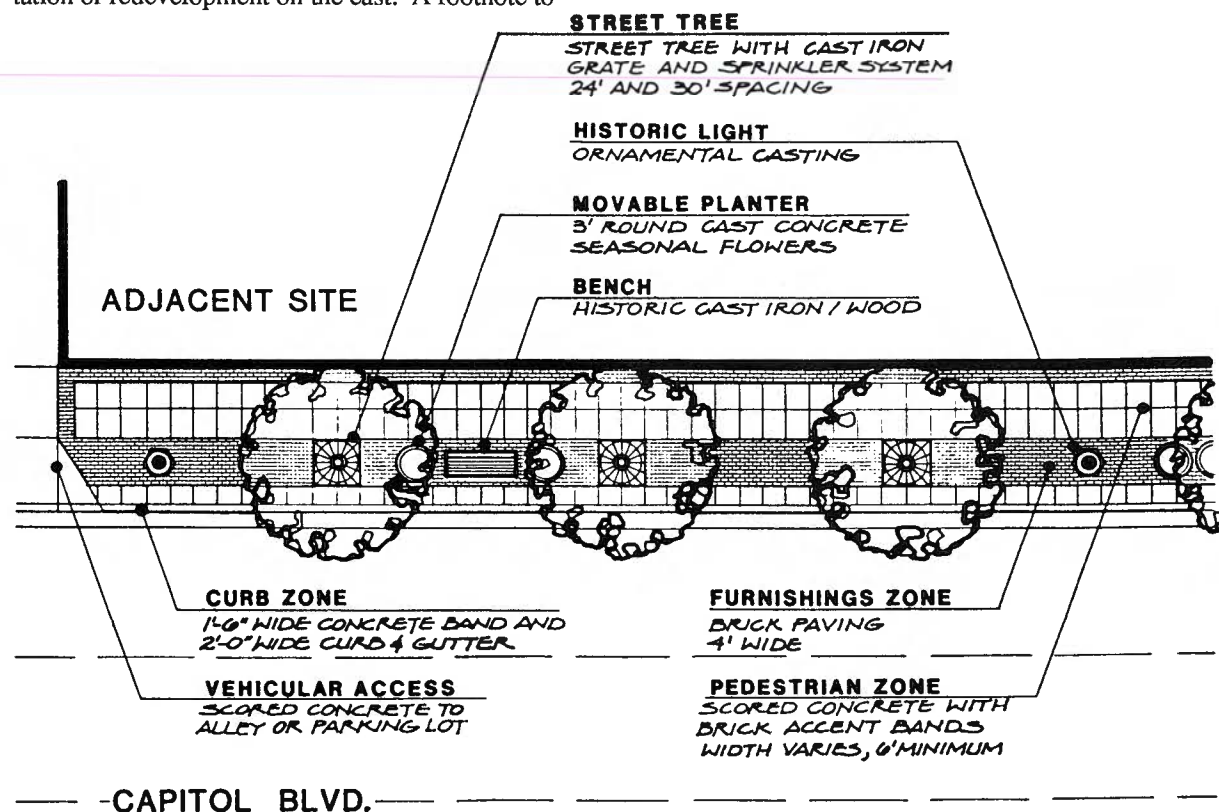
Streetscape prototype from Front Street to the Boise River. The adjacent private landscaped setback area could include an expanded sidewalk surface, plaza, or street wall to screen parking lots. An additional row of trees can also be planted on private property to form a double canopy over the sidewalk.
